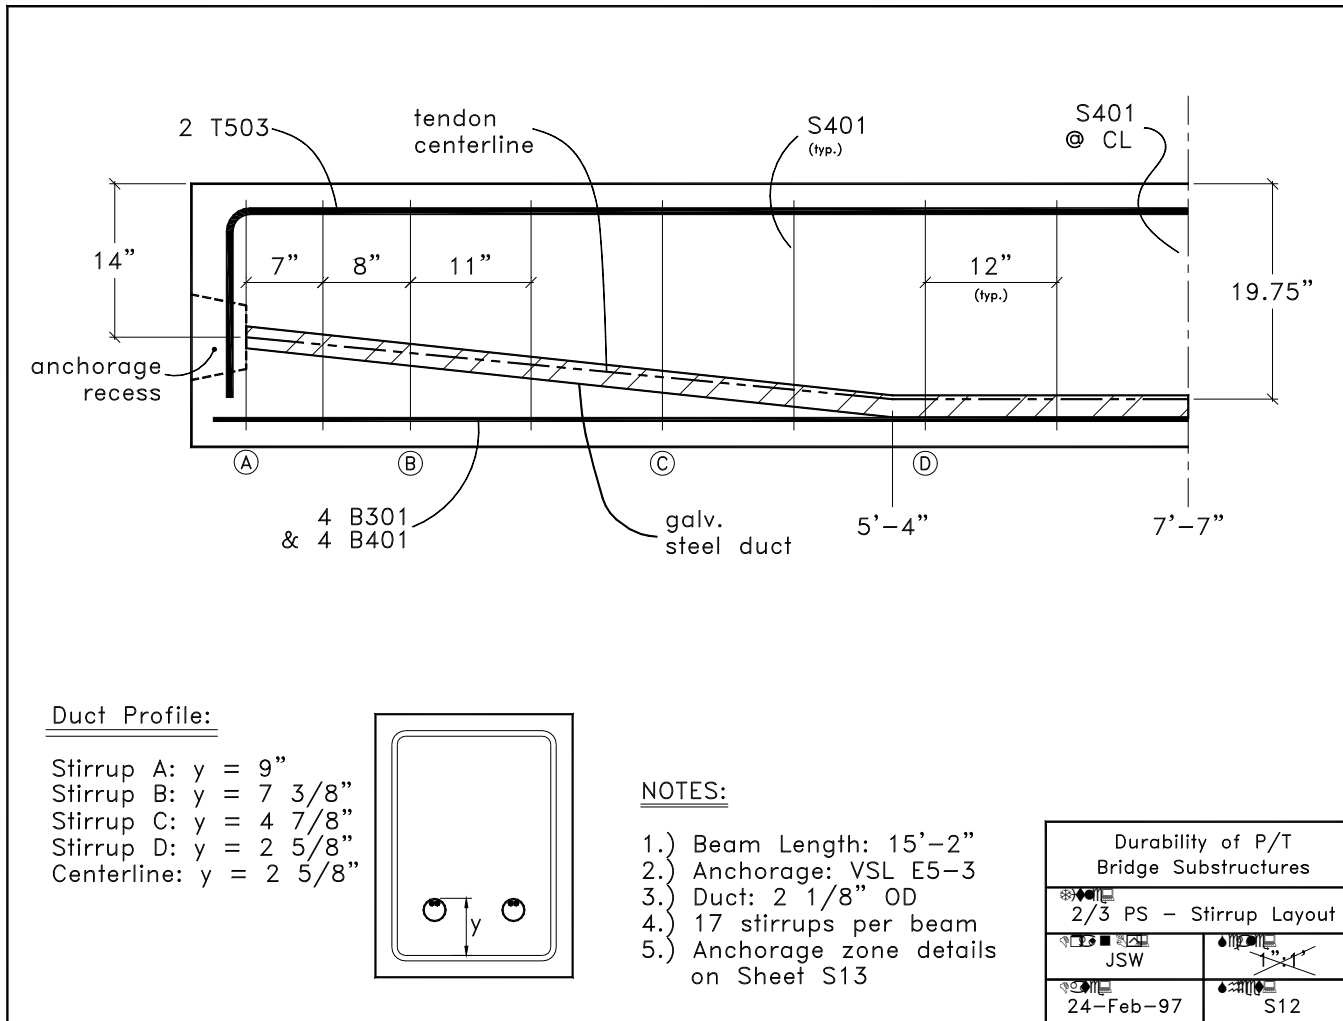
Sheet S12: 2/3 PS Stirrup Layout
